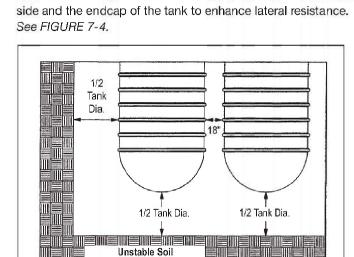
7.5.3.3. Stabilizing materials, such as a reinforced concrete slab, may be required under the tank as a foundation in addition to the required 12-inch bedding in an excavation where
